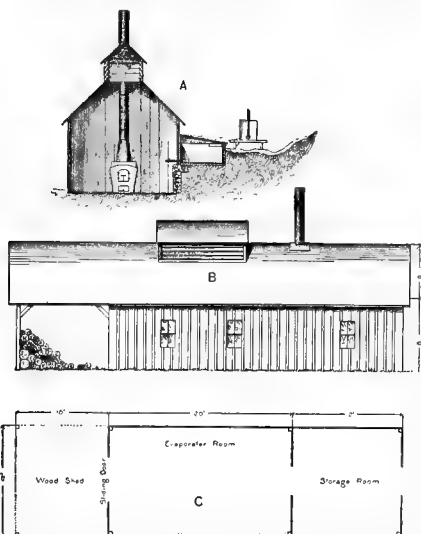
Plan of model sugarhouse: A, sectional view showing evaporator, storage tank, and gathering tank (on sled). B, elevation. C, ground plan.
